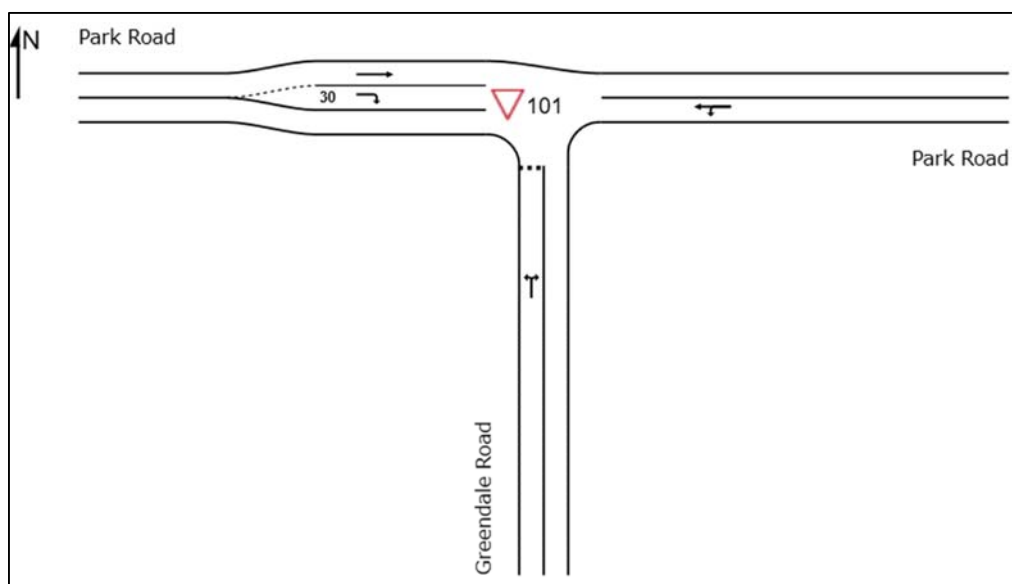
Priority Intersection of Park Road with Greendale Road (SIDRA)
